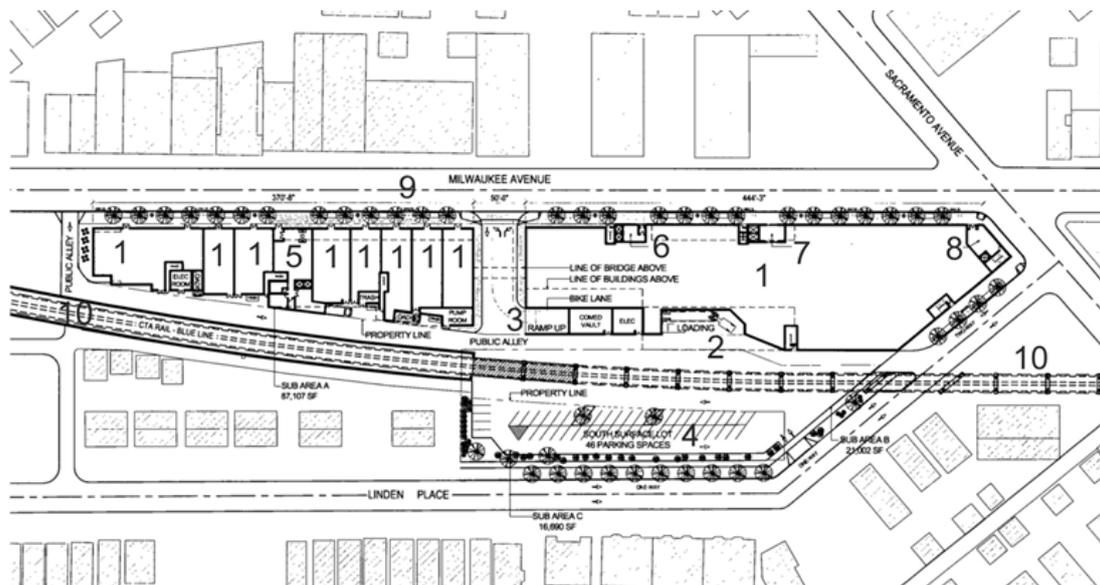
An example of the master plan of a multi-functional linear complex under reconstruction conditions (complex on Milwaukee Street, Chicago, USA): 1 – trade; 2 – loading; 3 – entrance to the underground parking lot; 4 – parking lot for 46 places; 5 – 8 – lobbies located on the upper floors: 5 – housing, 6 – restaurant; 7 – trade establishment; 8 – fitness centre; 9 – a city street with intense pedestrian traffic; 10 – overpass of the city railway
